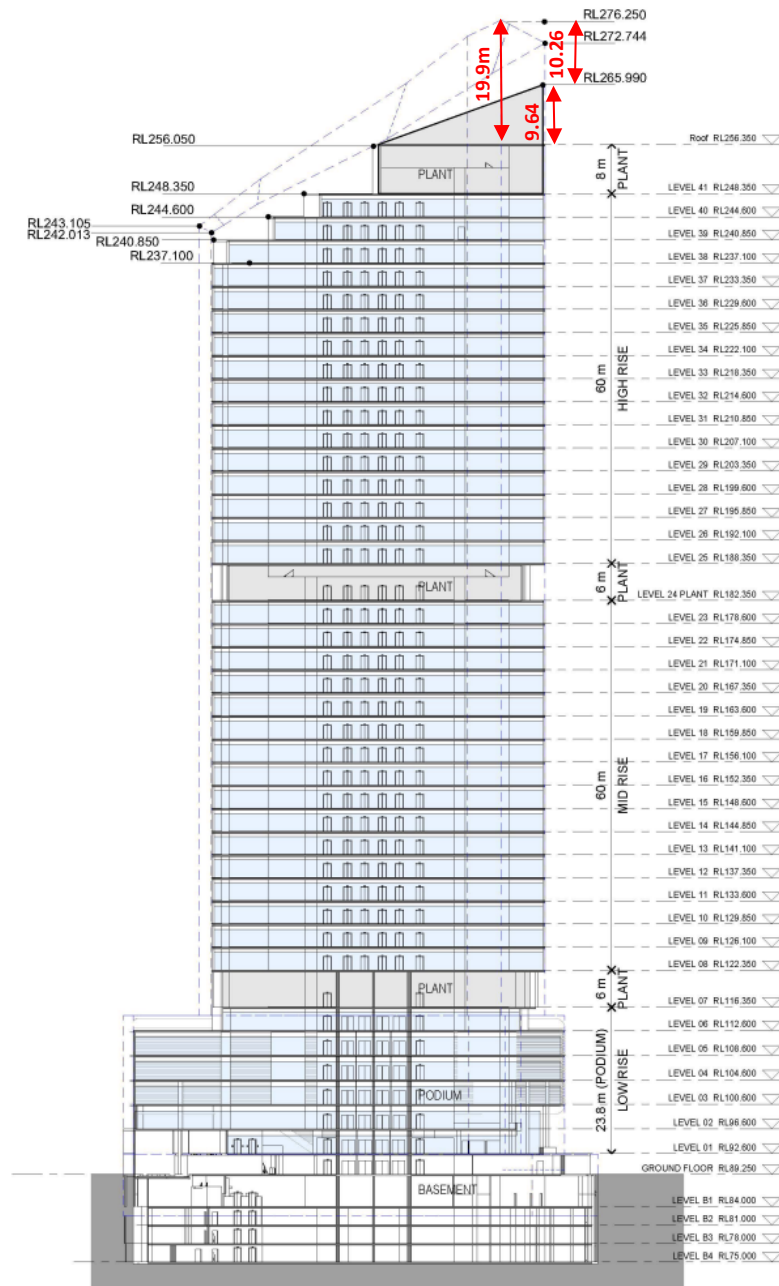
Indicative Section Plan (Applicant's Urban Design Report, p.80)
